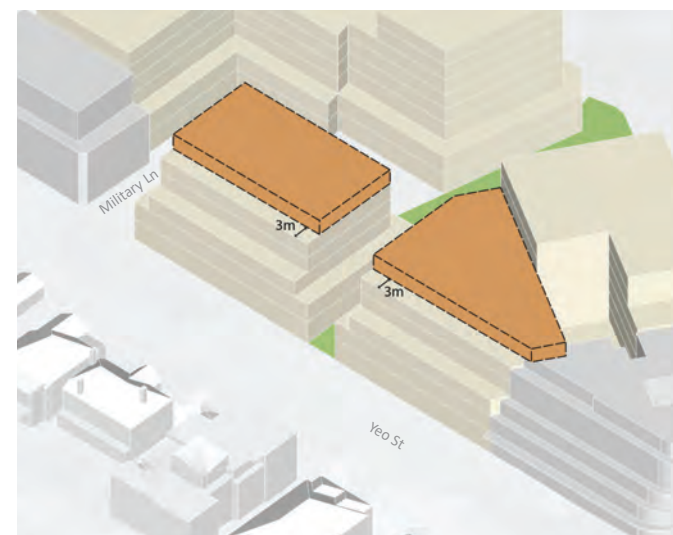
Proposed solar protection control - Yeo Street built form with upper-level setback
